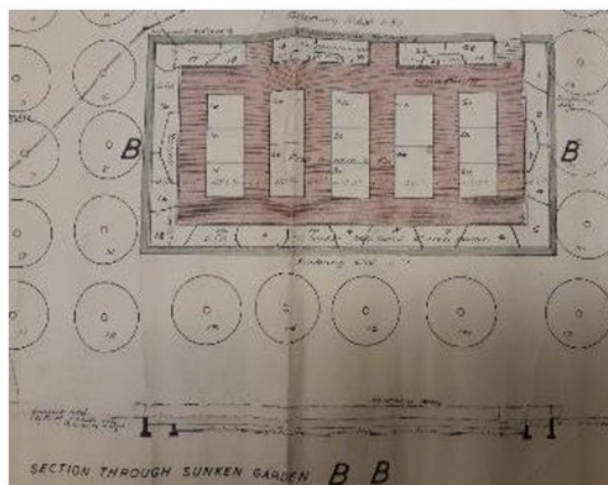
Plan for the sunken garden (City of London Cemetery Archive)
